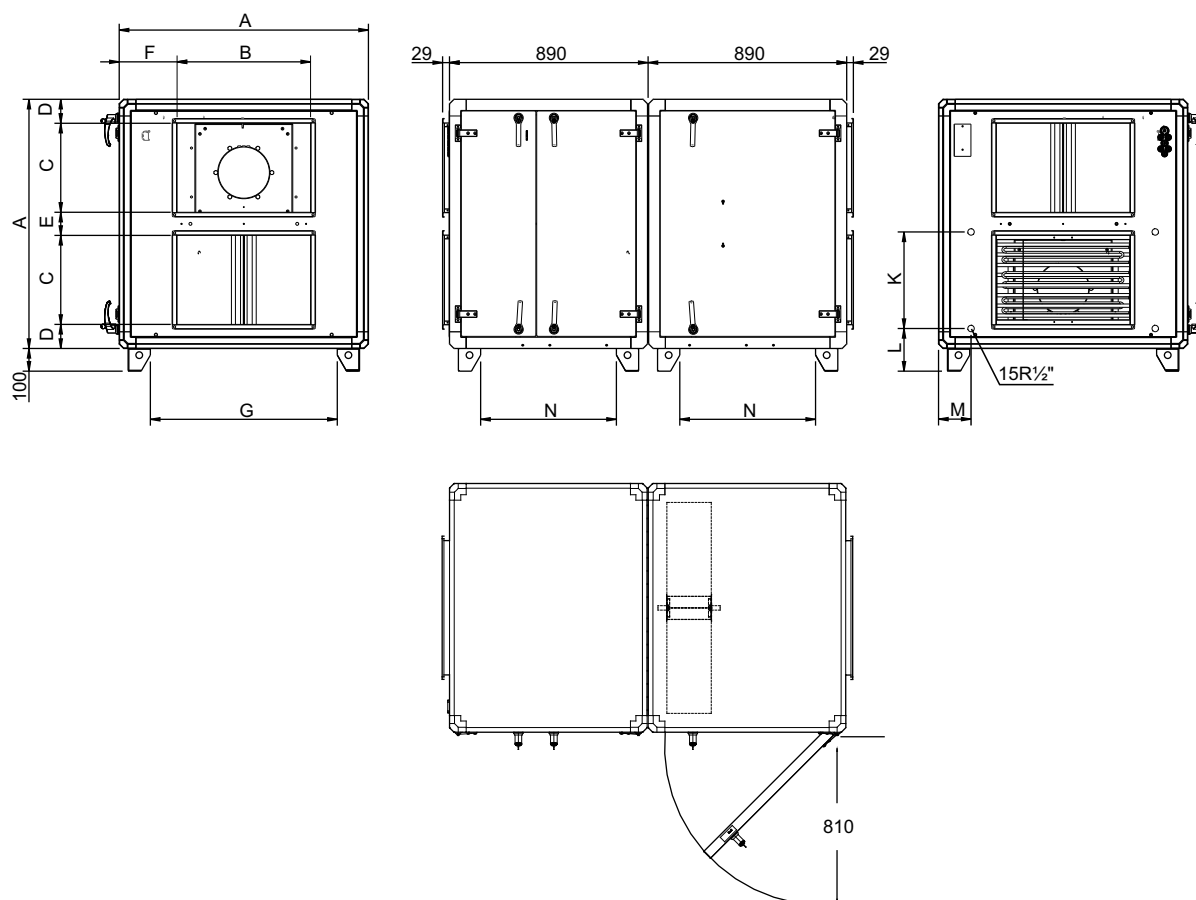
Dimensions (mm) Topvex SR 09, 11 (Drawn as left hand unit)
